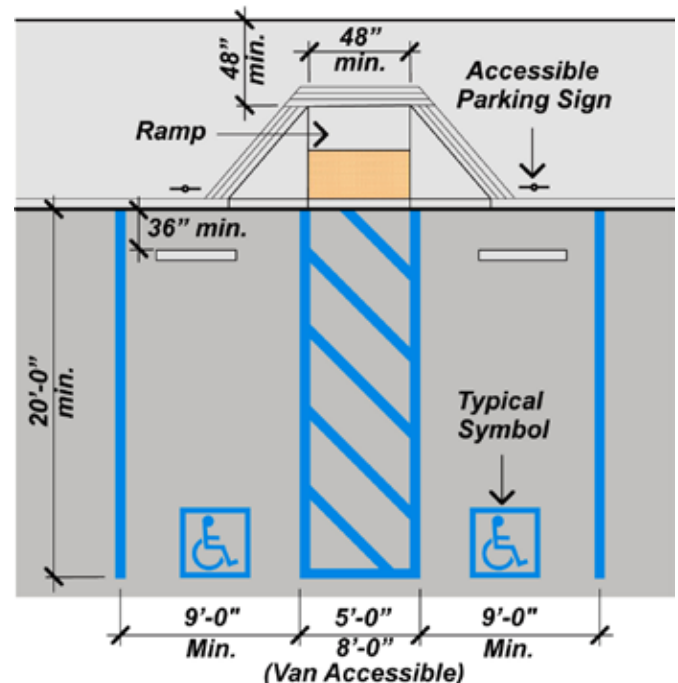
Standard dimensions for accessible parking stalls.
